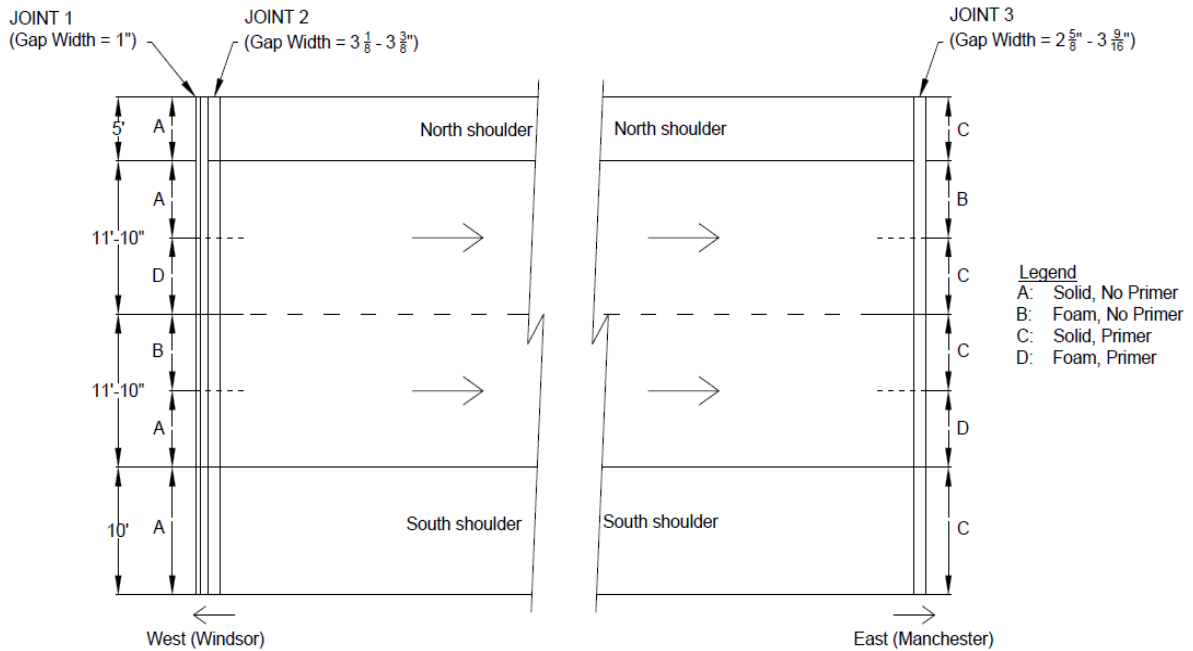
Sealant and primer placement plan, Route 291 Bridge
